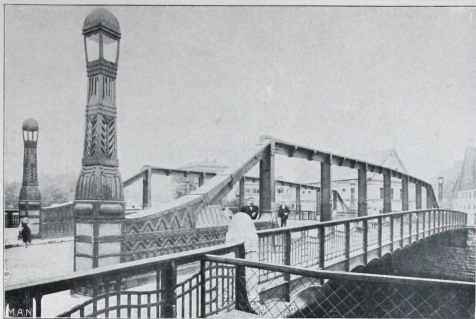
Road Bridge (Maxbrücke) at Fürth, Bavaria.
